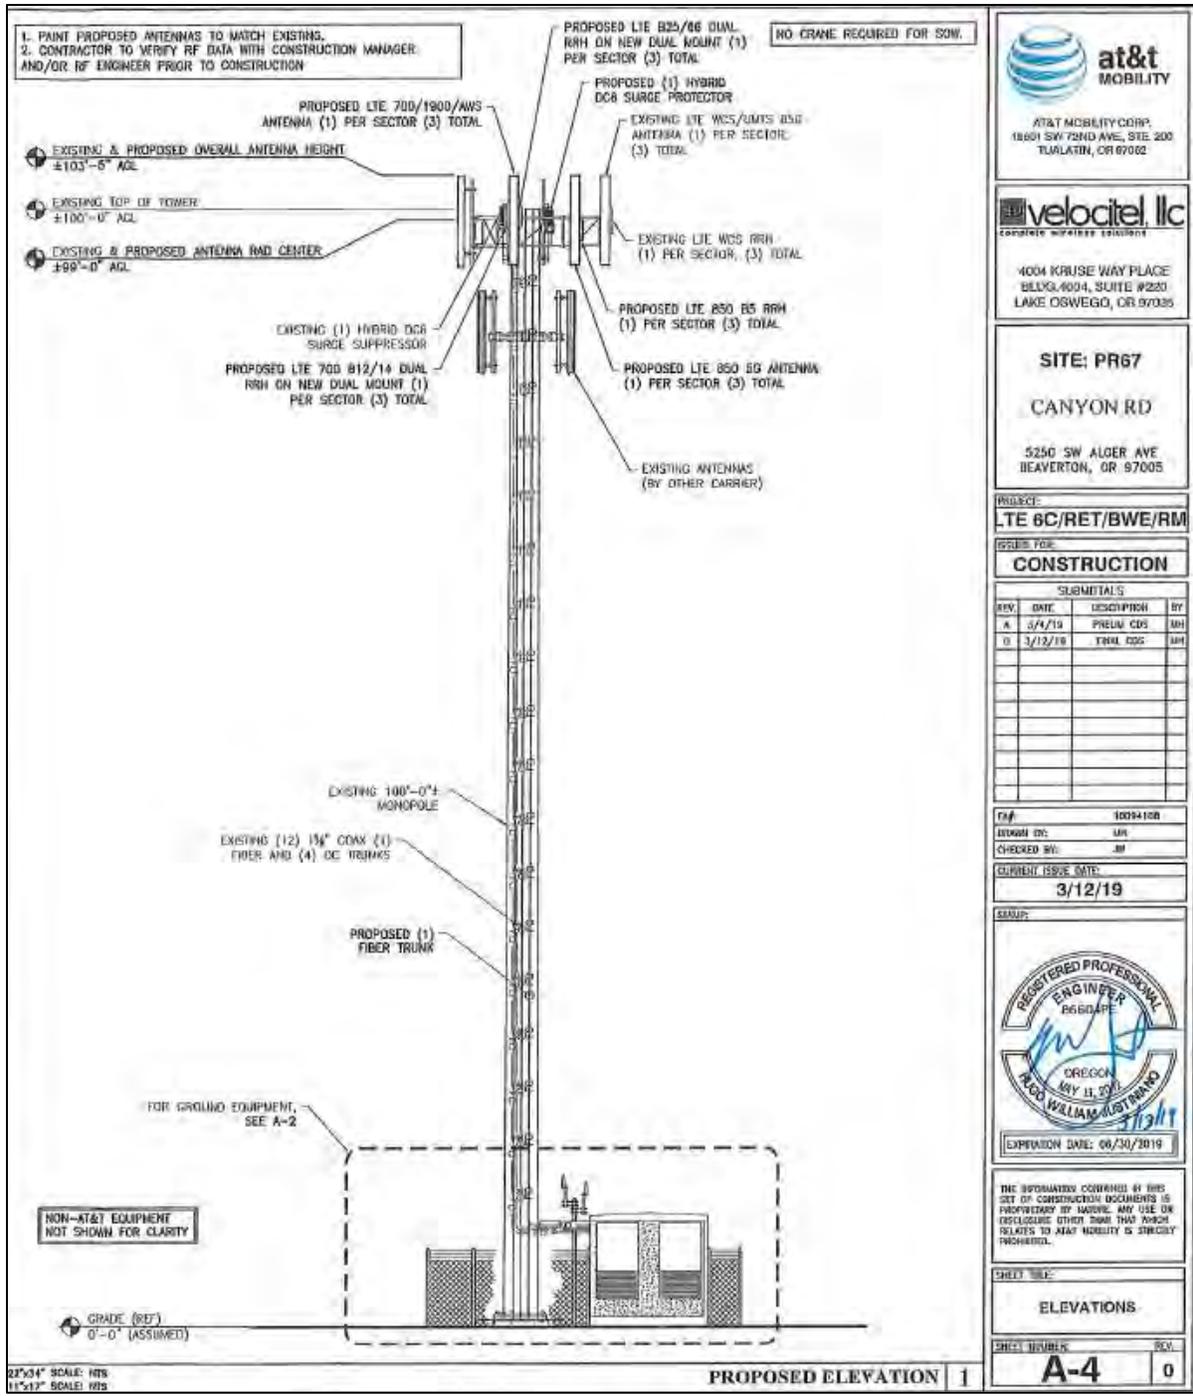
AT&T Modification Plans for Site PR67 (Mar. 12, 2019) depicting internal cable risers.
